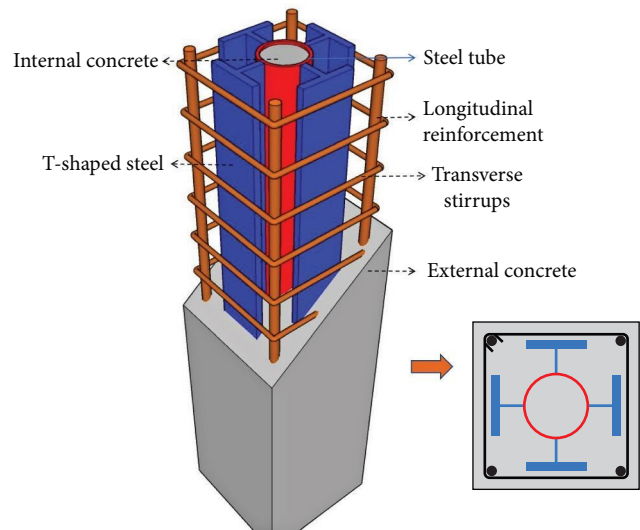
Core-steel tubes with T-shaped steel reinforced concrete (CSTRC) column.
